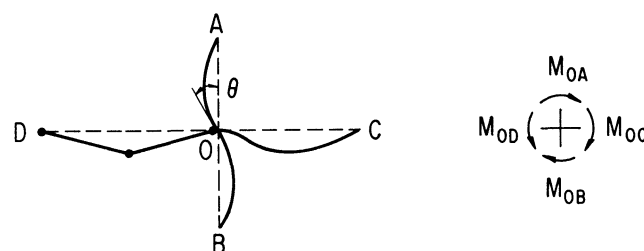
Girder-and-column system assumed in design of columns for checkerboard loading
